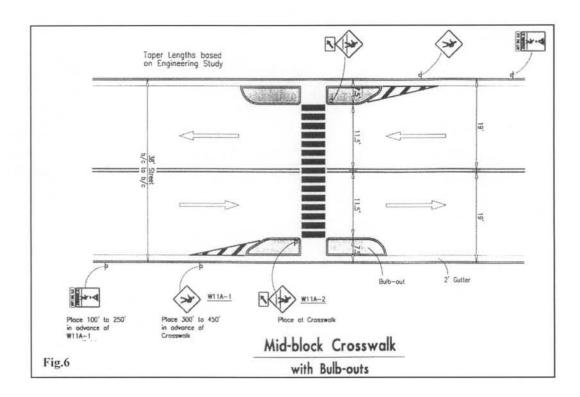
shows a typical mid-block crosswalk with bulb outs.
